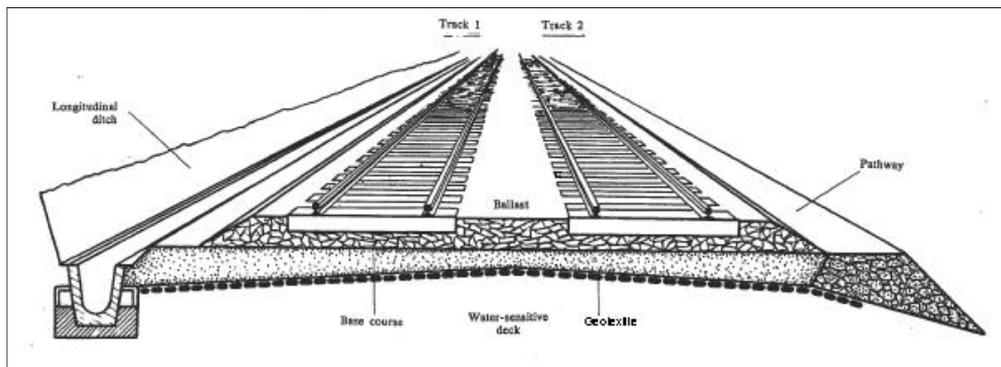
Geotextile as a filter medium under and next to railway (Kaytech)
